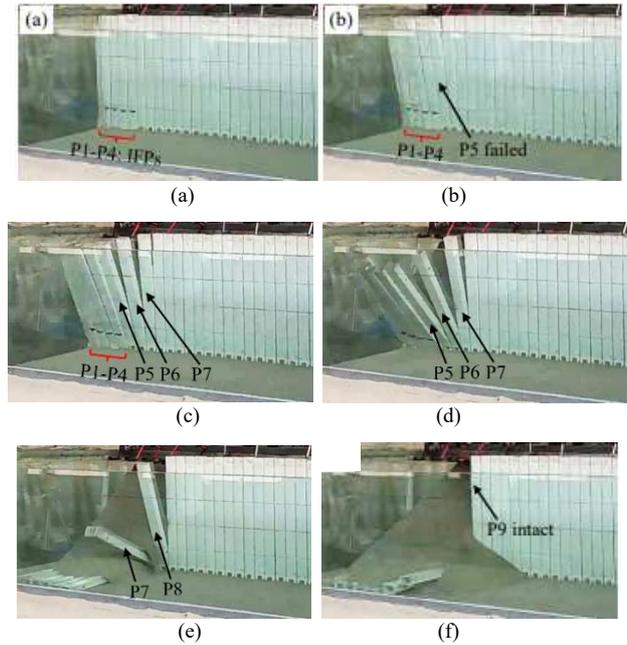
Collapse process after failure of four cantilever contiguous piles (Cheng et al. 2016) (a) before collapse (b) 2.0 s after the partial collapse, (c) 2.8 s after the partial collapse, (d) 3.2 s after the partial collapse, (e) 4.28 s after the partial collapse and (f) final stable status.
